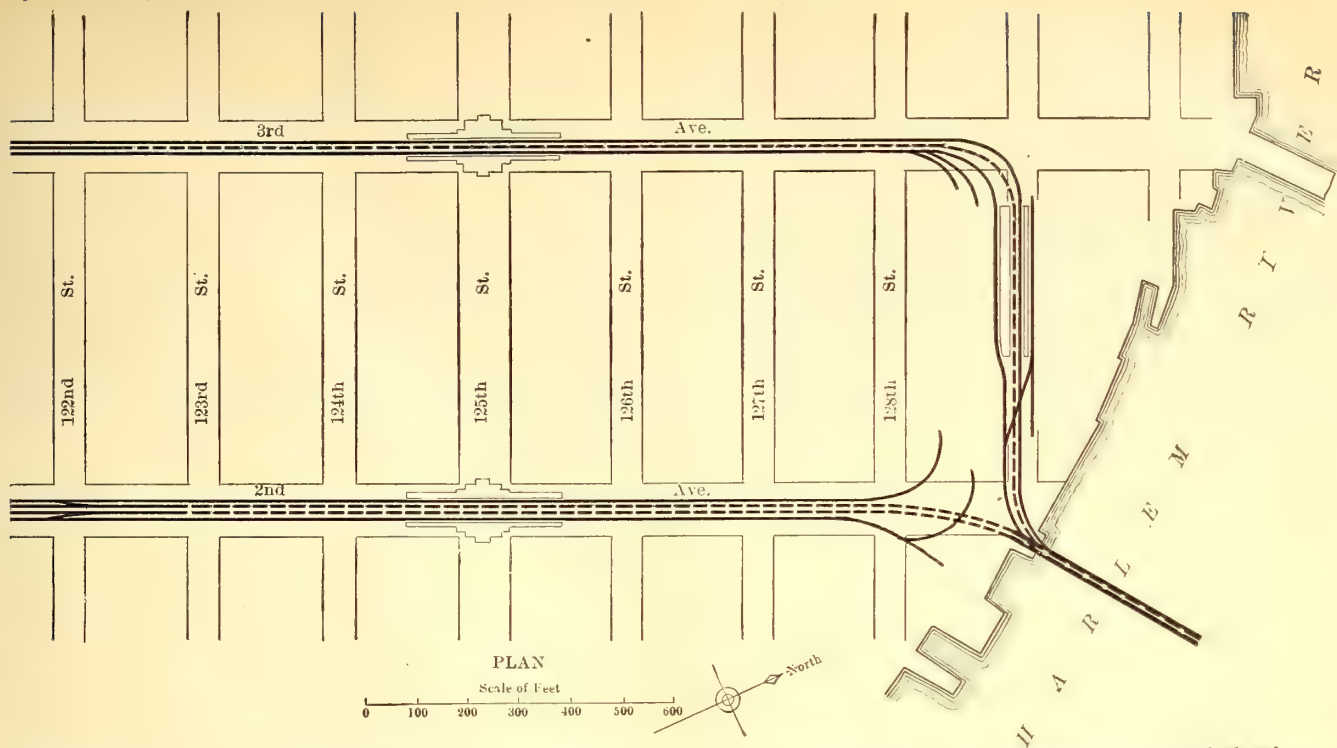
PROPOSED LAYOUT OF SECOND AND THIRD AVENUE ELEVATED TRACKS APPROACHING THE HARLEM RIVER
